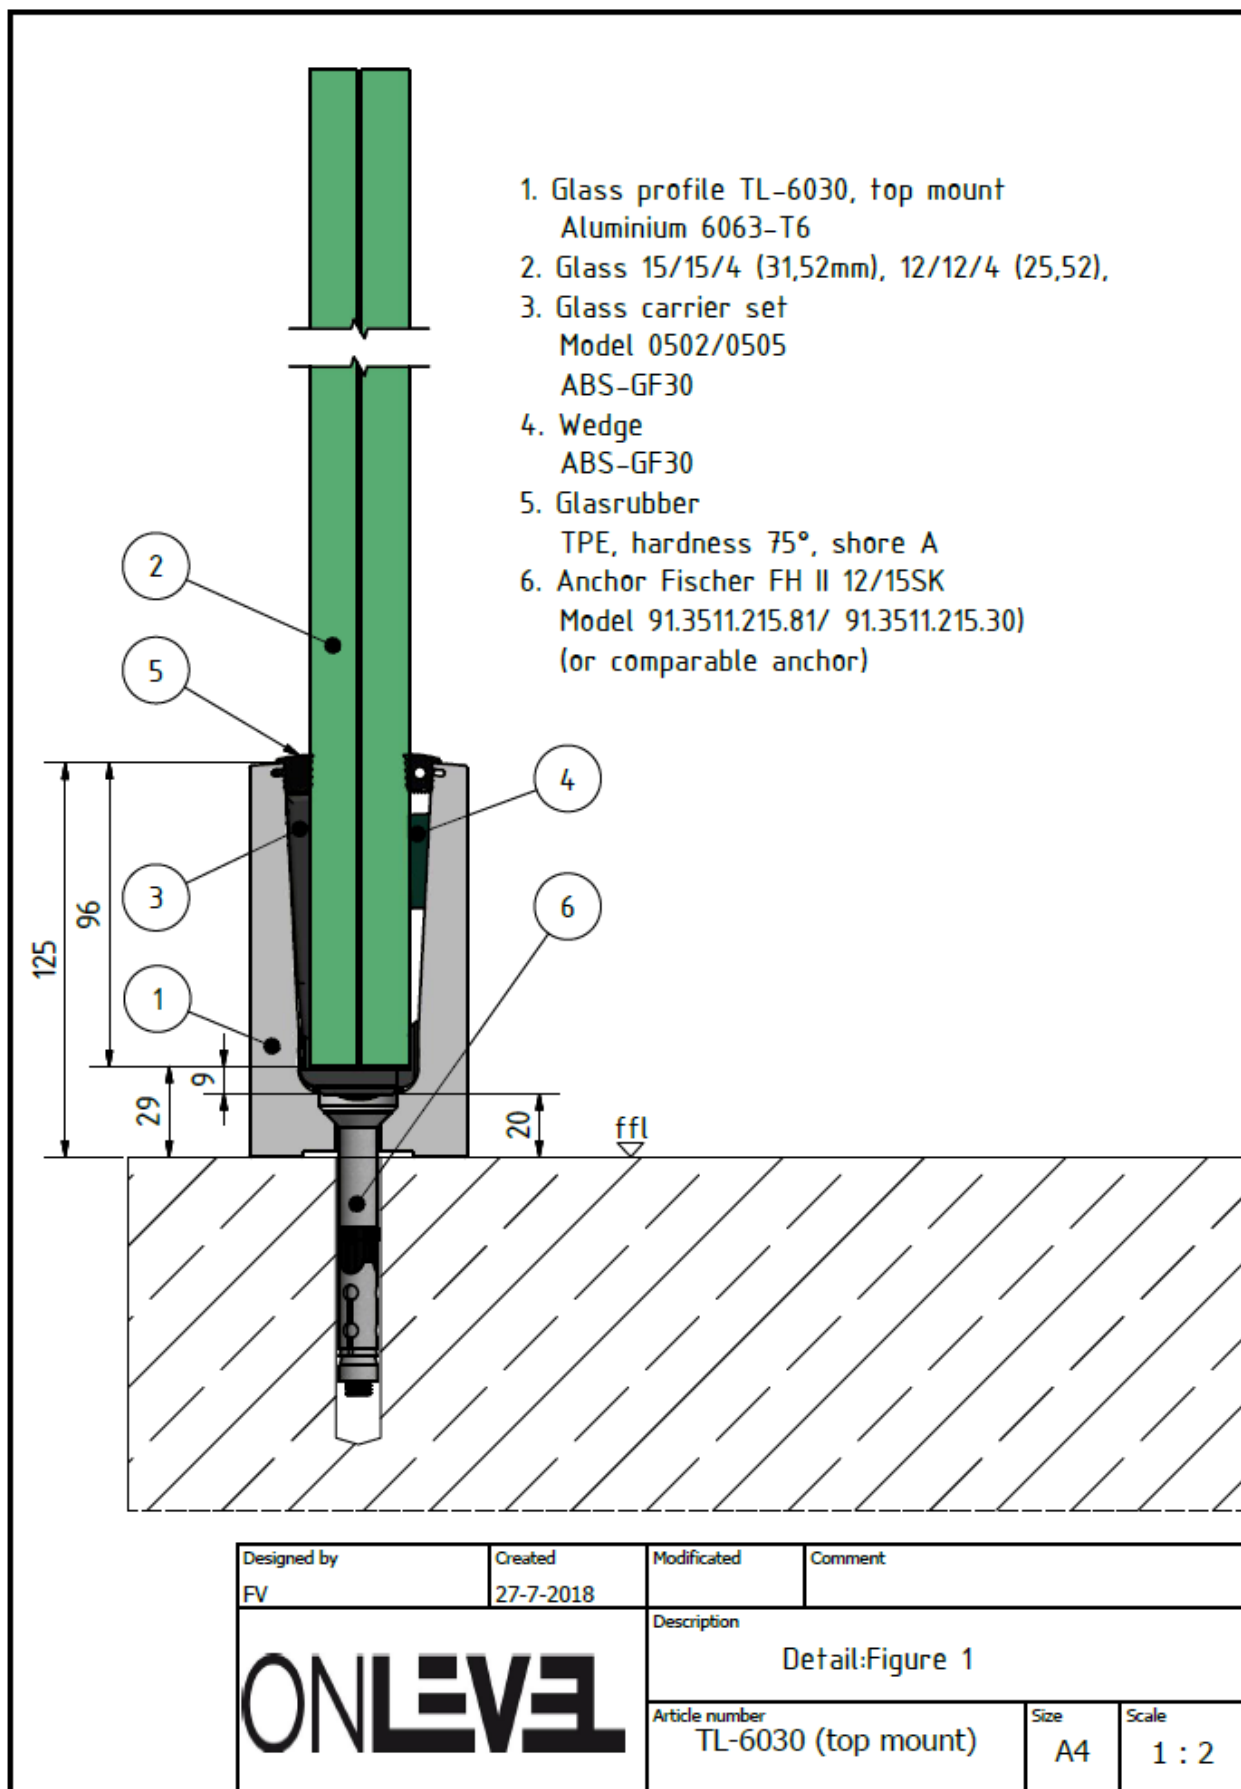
17. Product drawing from OnLevel for profile 6030 Top Mount – 3.0 kN/m, sheet 1 of 4.
